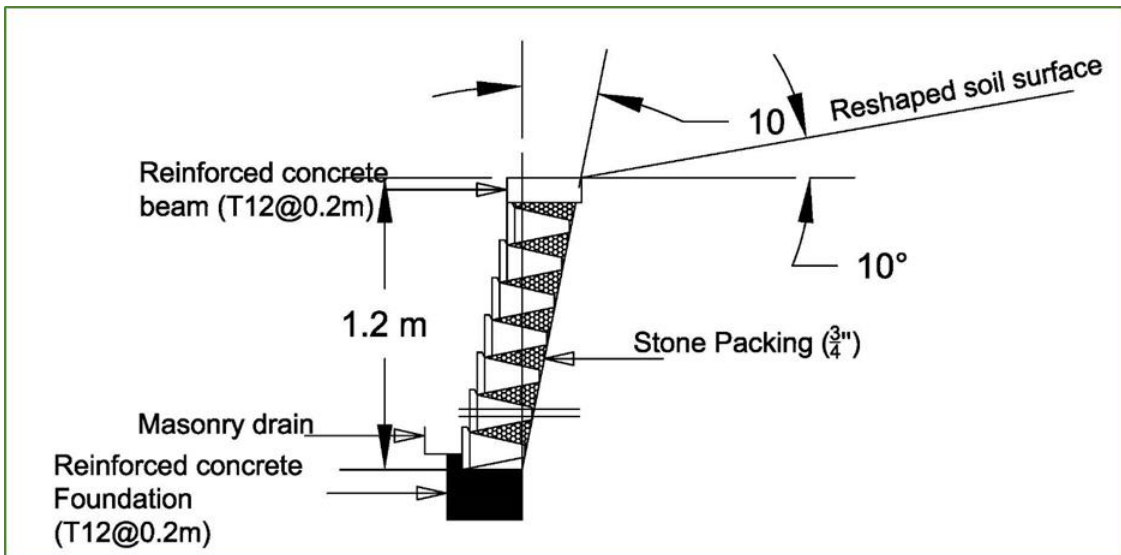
Design details of a TOR block wall (Adapted from Soralump *et al.*, 2020)
